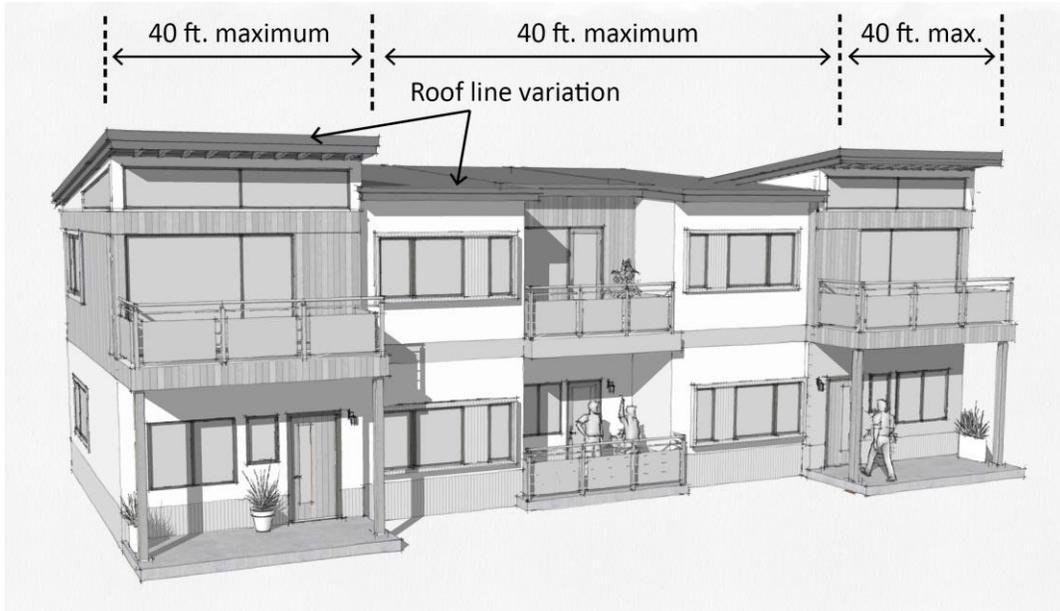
(B)(5): CORNER FACADE ARTICULATION
